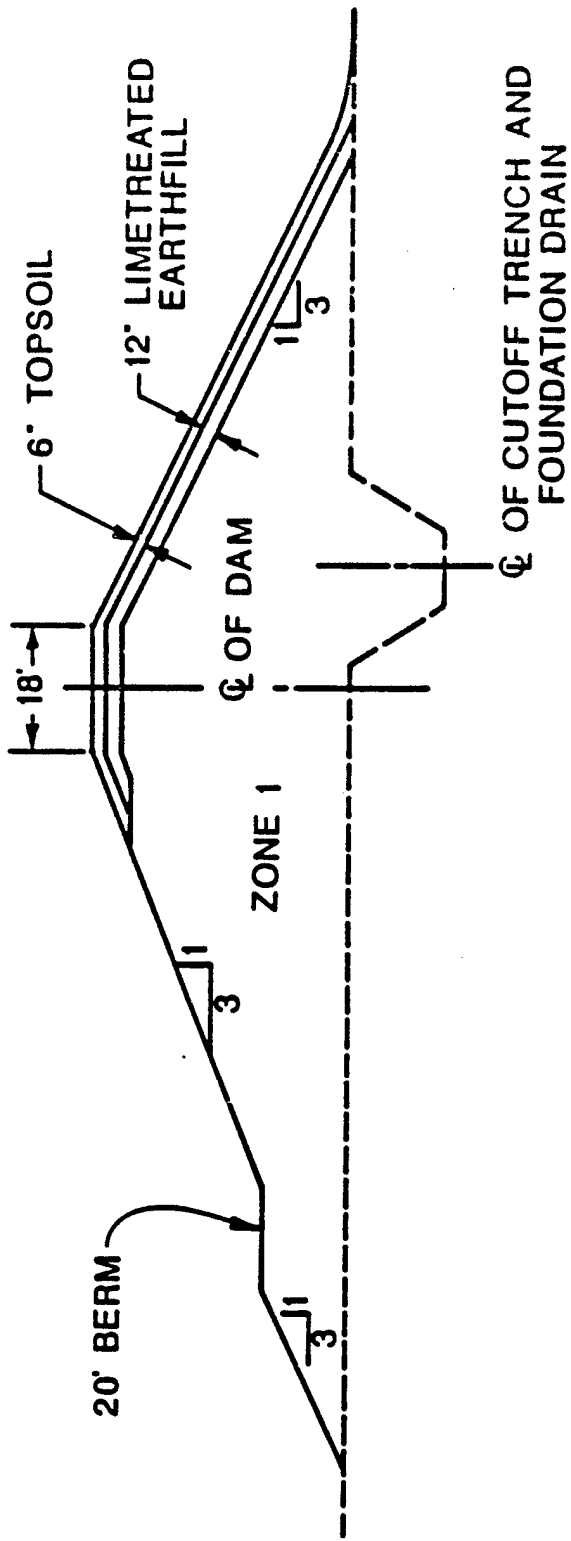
Typical section used for preventive treatment of erosive soils at Sillwater Creek (Boomer Lake) embankment.
